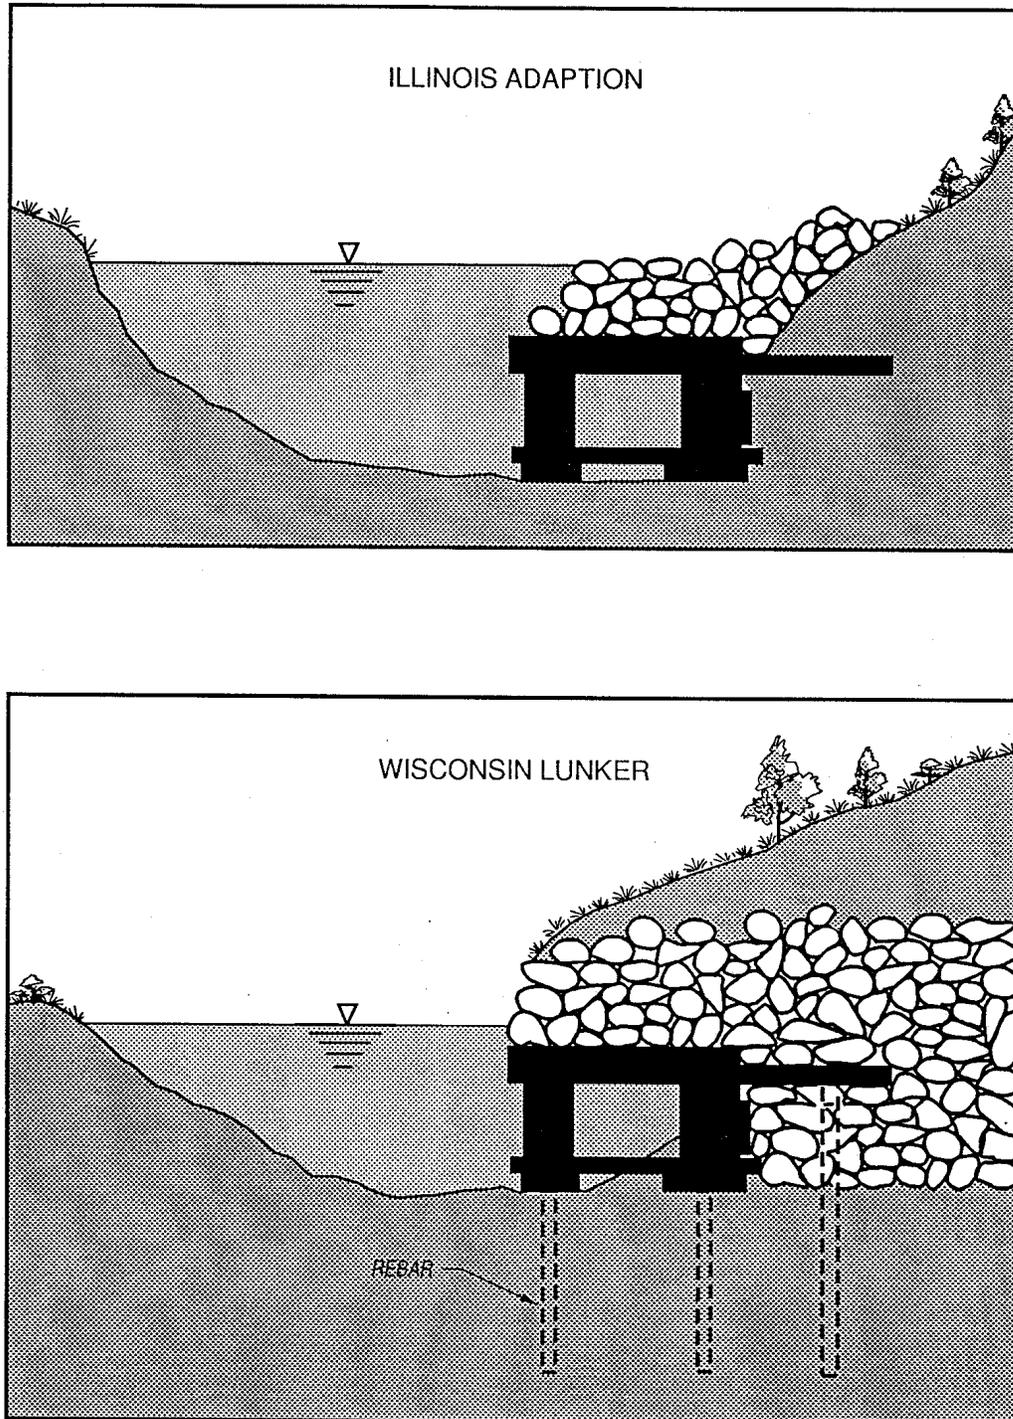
Two schematics (two different versions) of a LUNKERS structure designed to provide overhanging shade and protection for fish while serving to stabilize the toe of a streambank. Both versions use rebar although rebar is not shown on the upper schematic.
